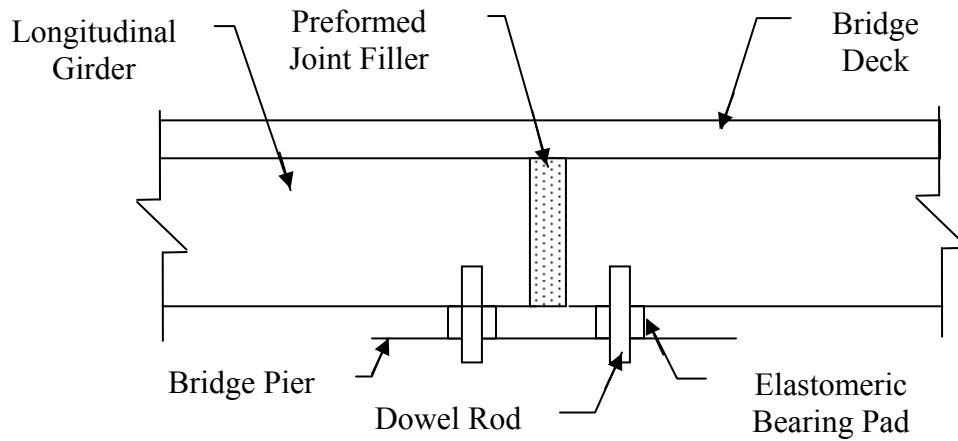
Dowel rod through pier cap, bearing pad, and girder
